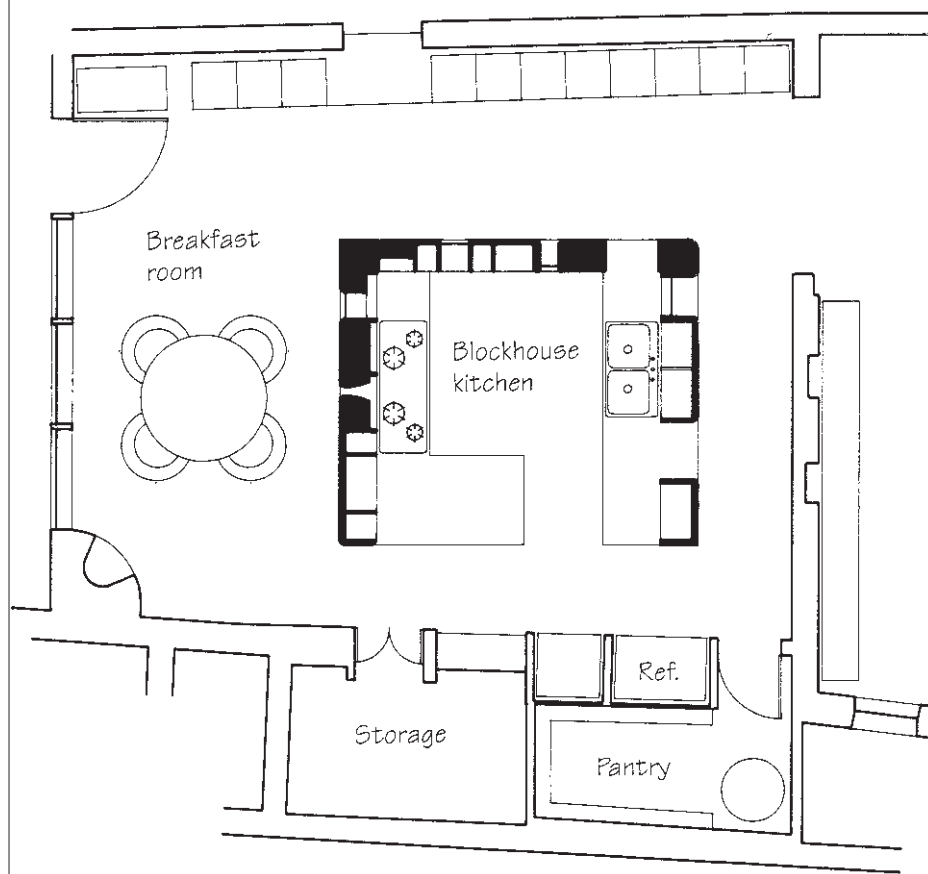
This floor plan shows Alexander Girard's "kitchen within a kitchen." Openings in the thick adobe walls offer plenty of visual transitions between odd-angled rooms.
